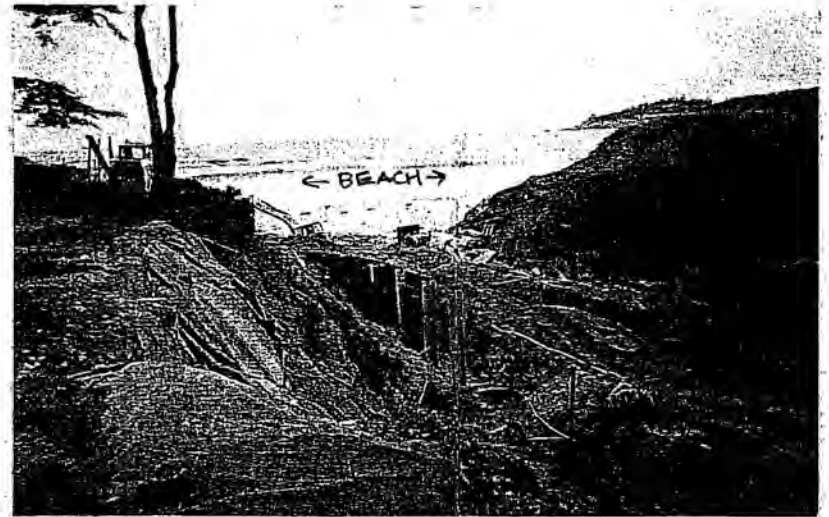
Western end of Lower Retaining Wall Under Construction, May 1999
